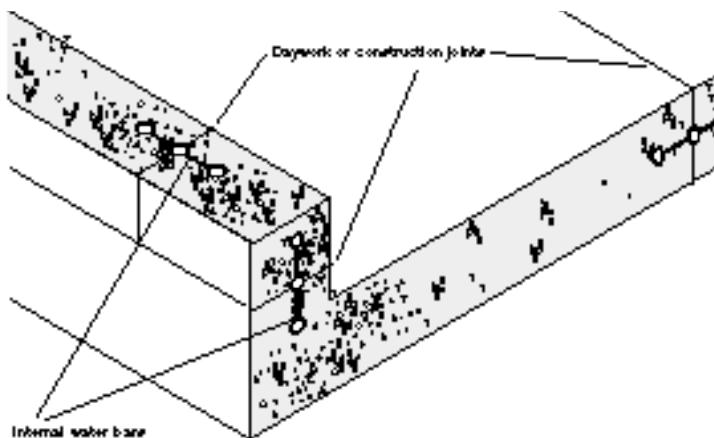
Dumb-bell section rubber or plastics strip cast into the open face of the shuttering
